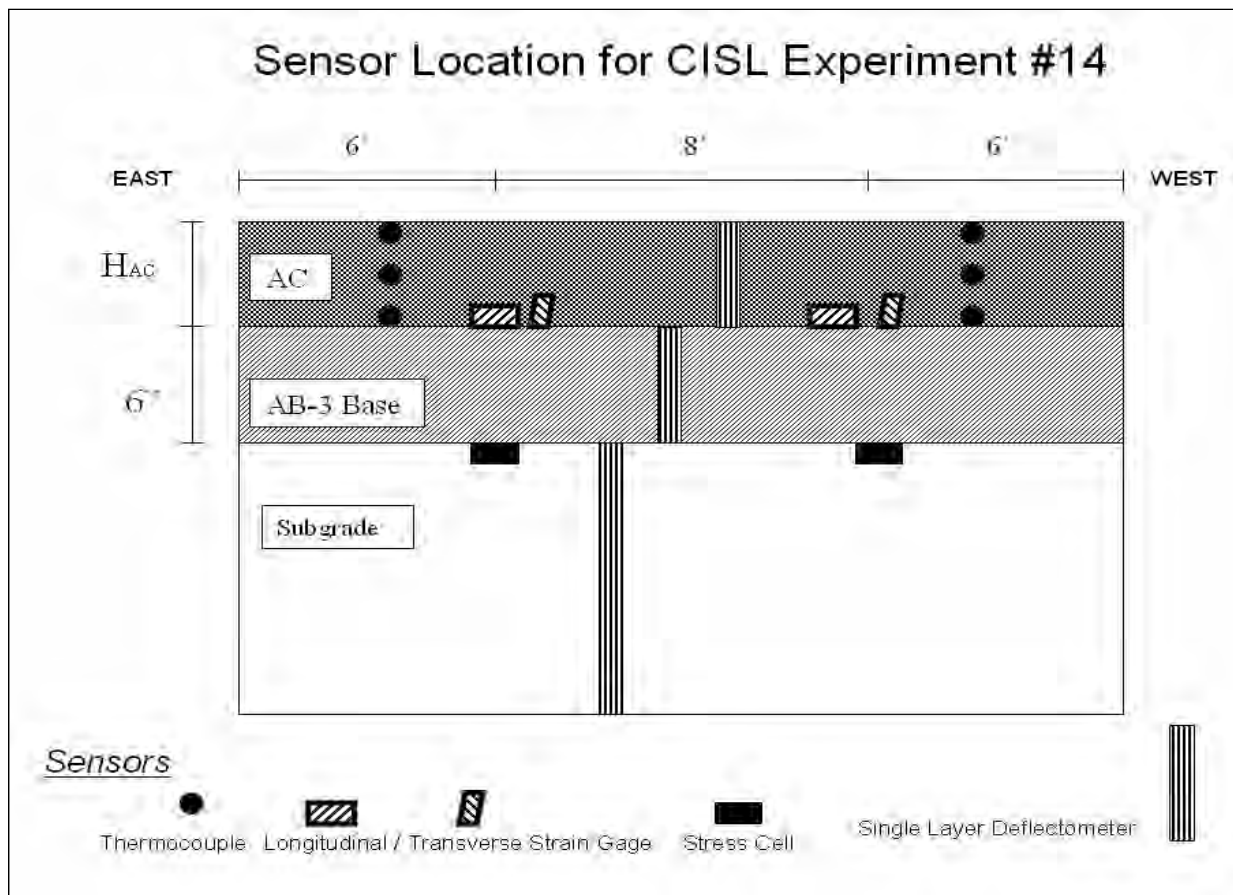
Location of Sensors Embedded in Pavement Structure
